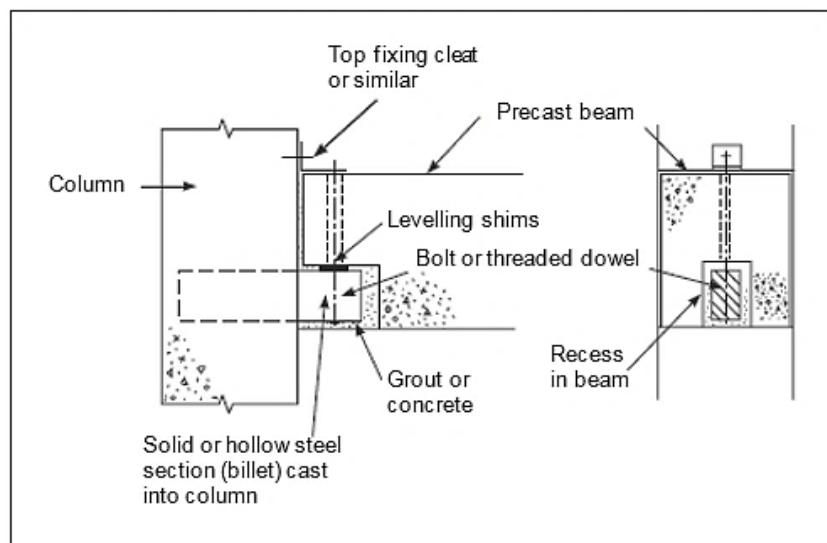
Beam to column connection using a billet (Elliott, 2002)
